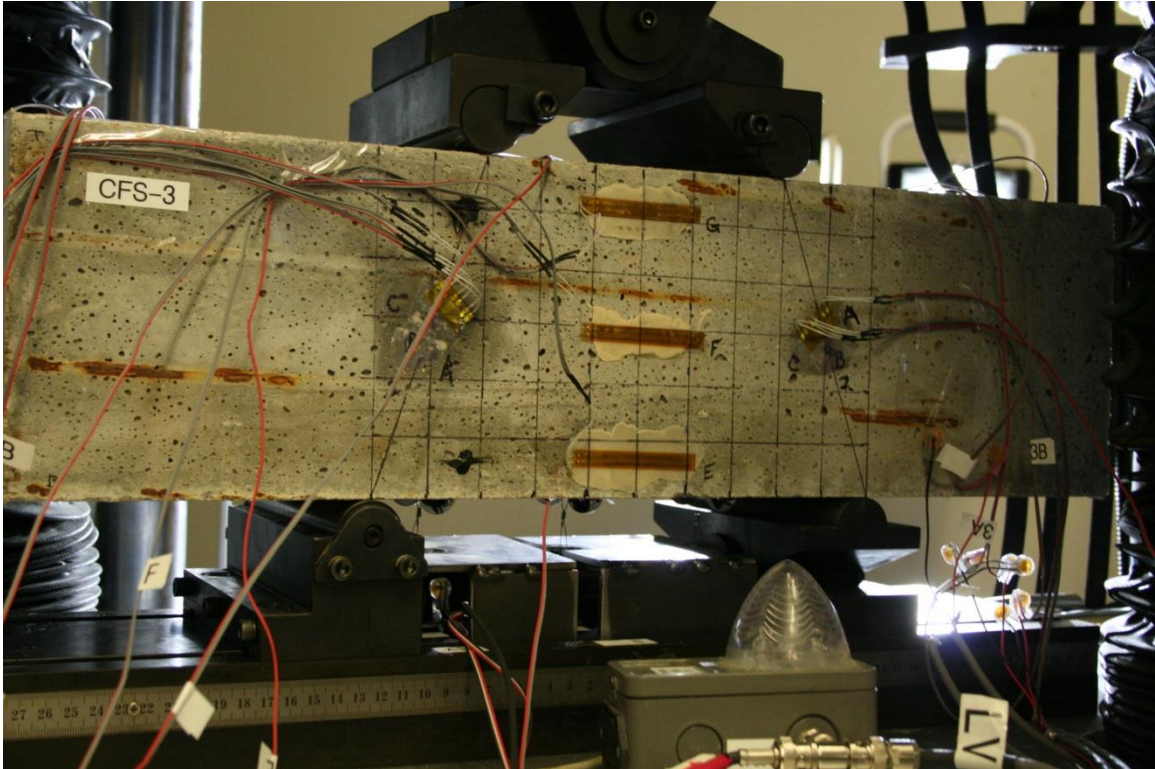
Test Setup for Test No. CFS-3 [10-in. (254-mm) Span]
